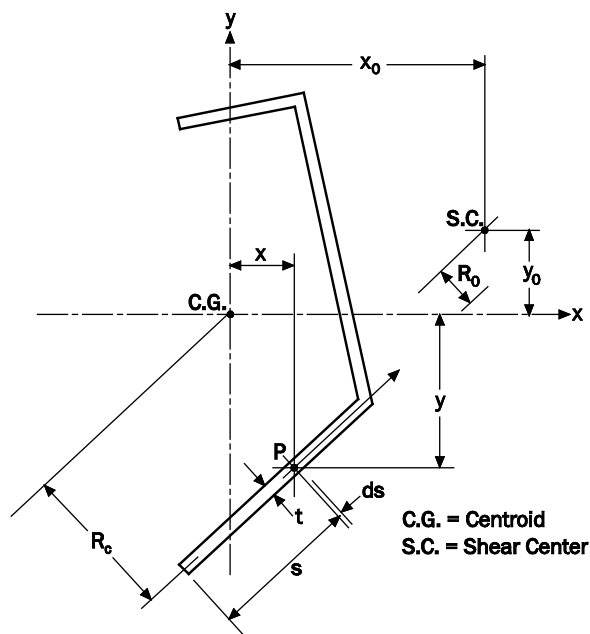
Non-Symmetric Cross-Section
